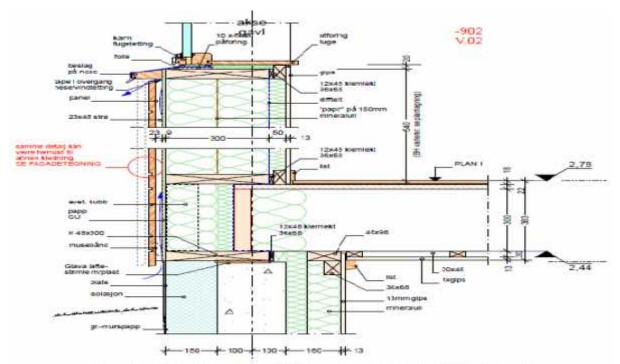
detail of the outer wall Miljøbyen Granås. Enebolig A1-077-vindu.smi)
